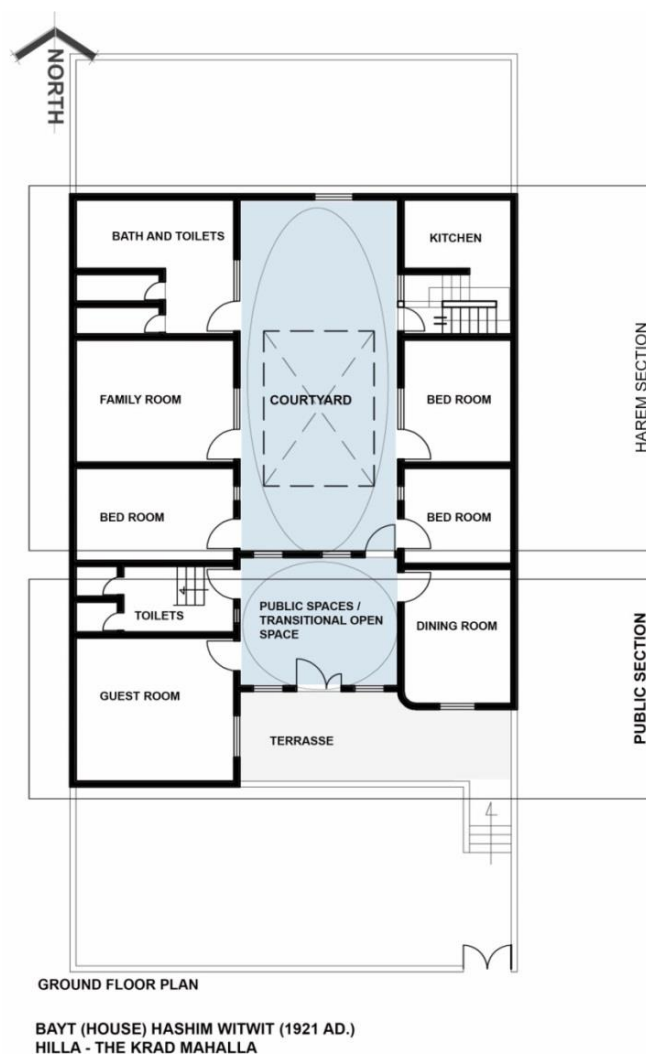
The ground floor plan of Bayt Hashim Witwit, Krad *mahalla*, Babylon-Iraq, 1921 AD.
